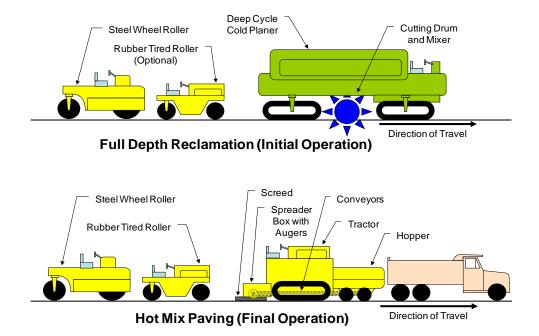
Schematic of FDR Equipment (sheeps foot not shown)
